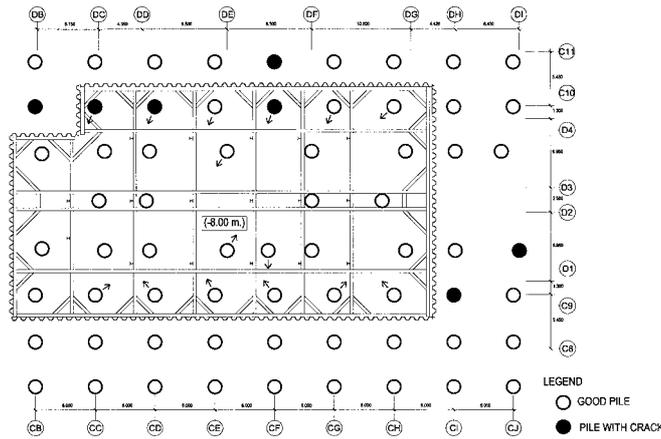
Plan of Excavation and Location of Damaged Piles and Pile Movements (a Portion of Project Area) Case III
